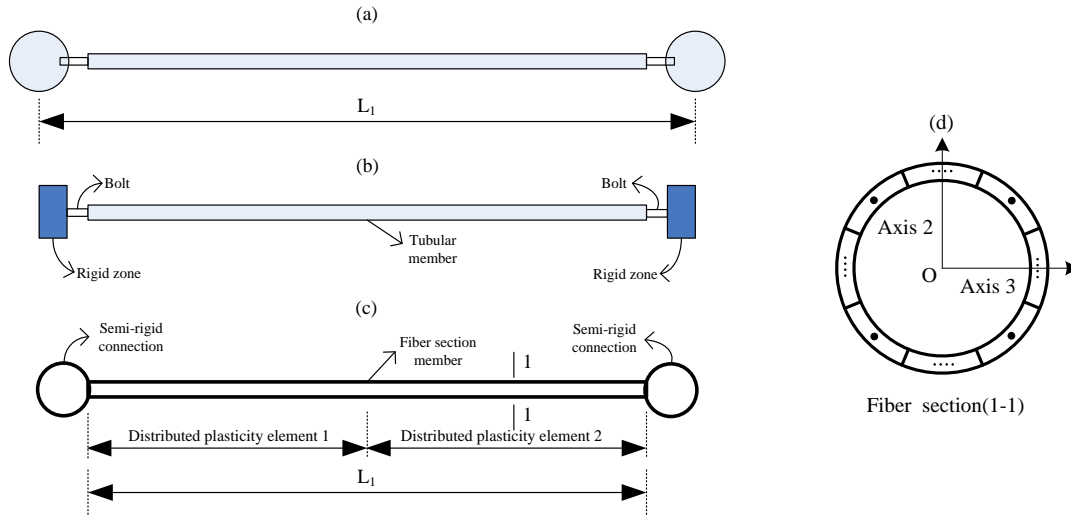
Mechanical model of joint-tube-joint group and fiber cross-section
